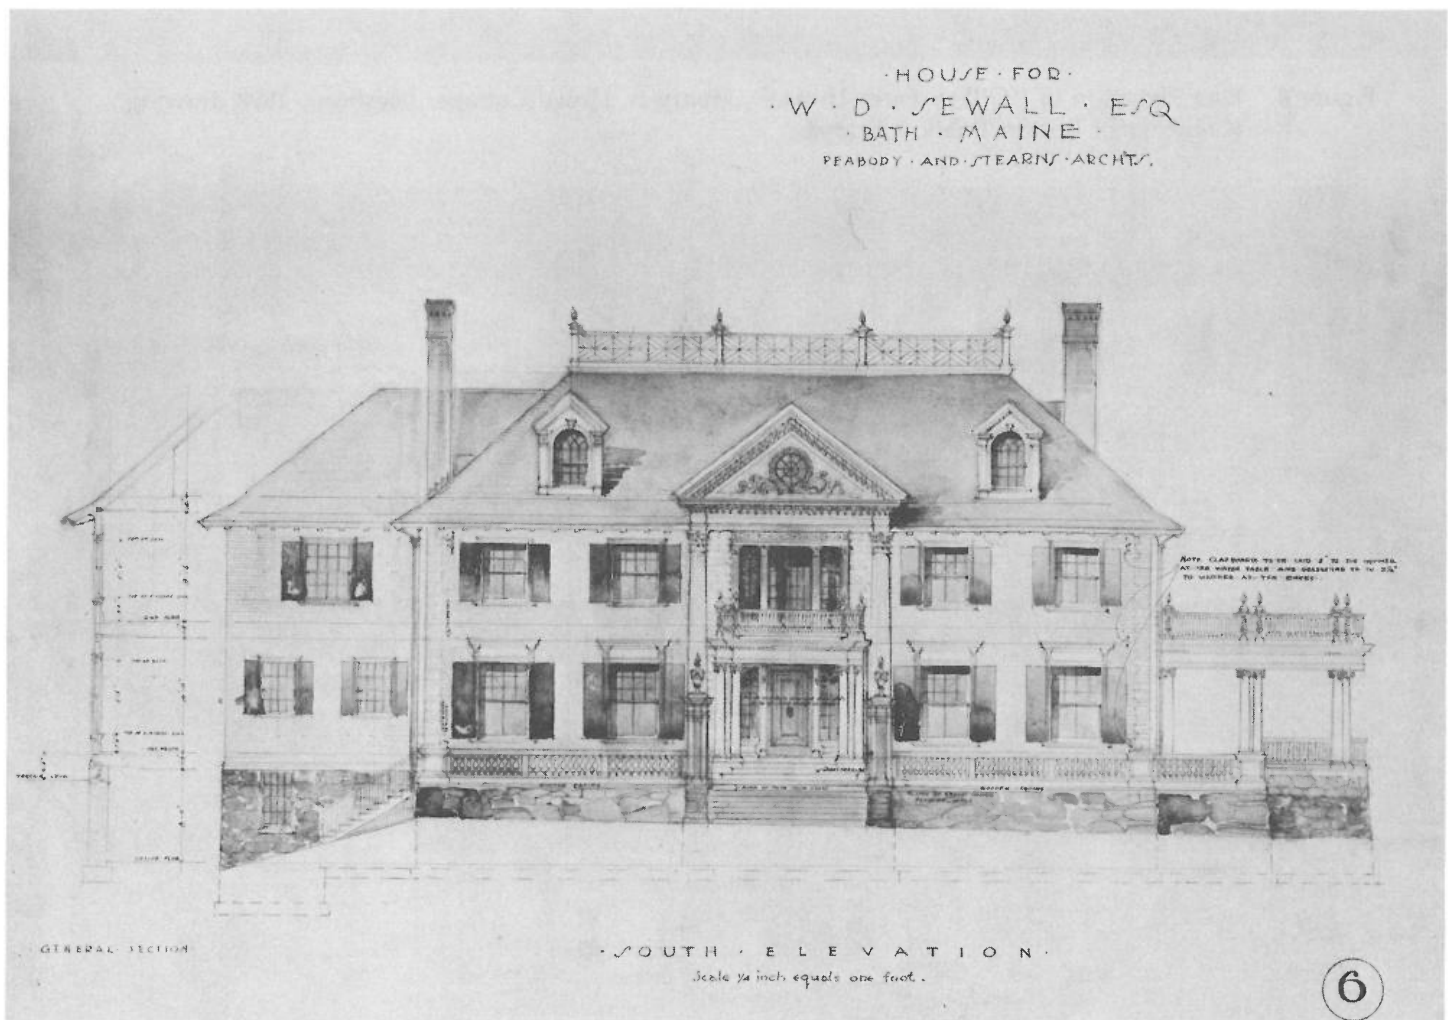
South Elevation of William D. Sewall House, Bath, 1896 drawing (Courtesy of Boston Public Library).
